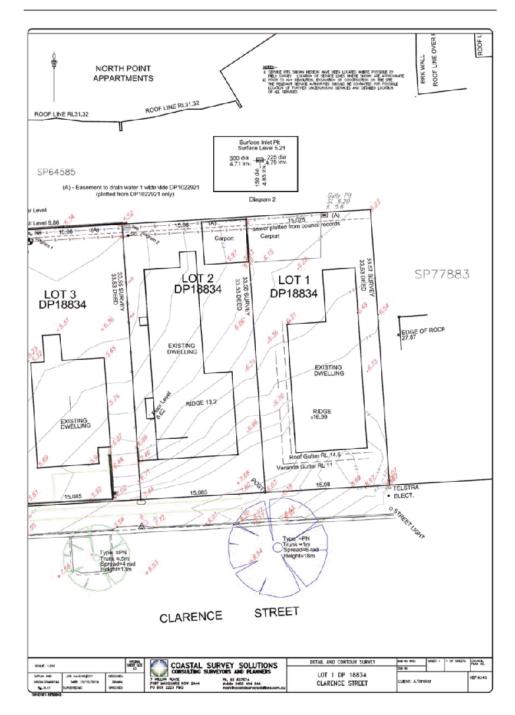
Current survey of the study site, showing details for 15 Clarence Street (Lot 1 DP 18834), as well as contour details for 17 (Lot 2 DP18834) and 19 Clarence Street (Lot 3 DP18834).
